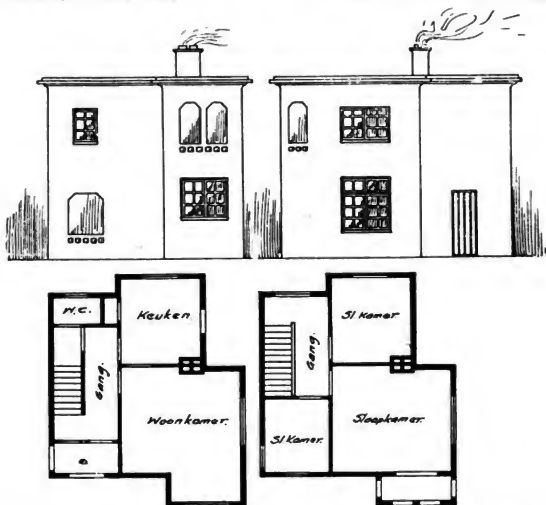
FIRST AND SECOND STORY PLANT, AND ELEVATIONS OF HOUSE AT SANTPOORT, HOLLAND.
